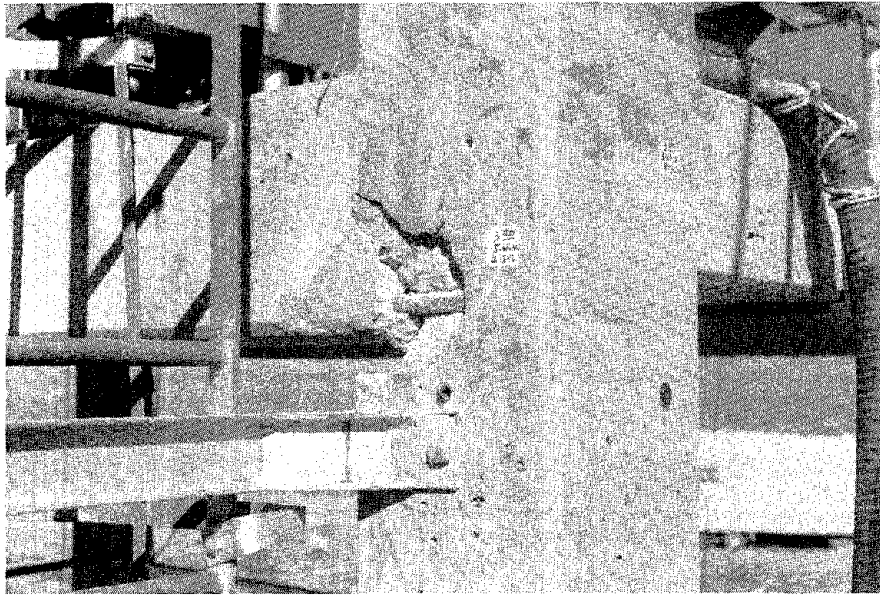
DAMAGE FROM THE 1979 TEST AT THE SOUTHWEST CORNER OF THE THIRD FLOOR OF THE EPOXY-REPAIRED STRUCTURE
